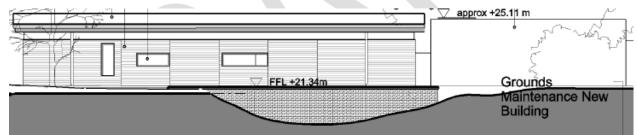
Proposed East (rear, facing Carriage Drive) Elevation, including containers to the right.
